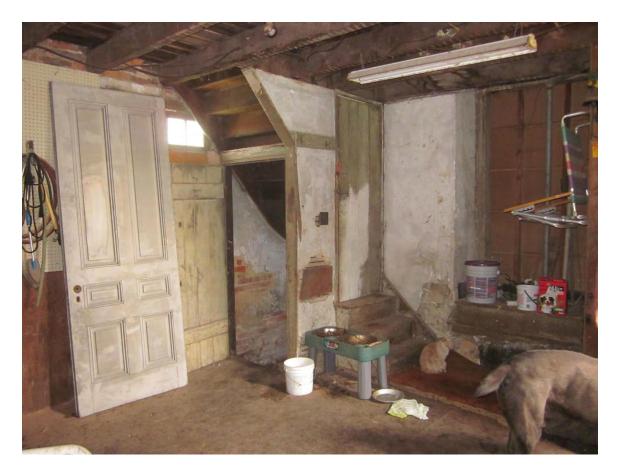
Mifflin House, Addition, enclosed stair to second floor and cellar of main house.
